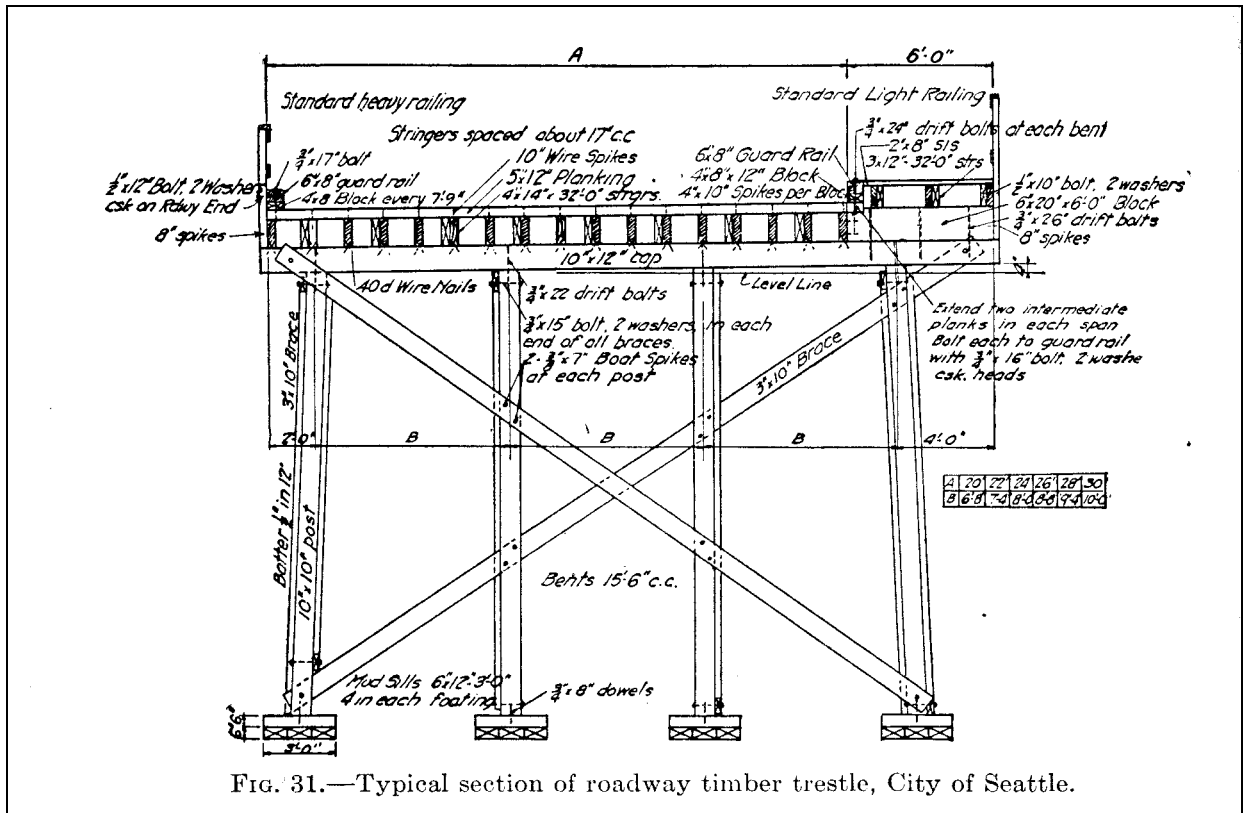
Typical section of roadway timber trestle, City of Seattle.
